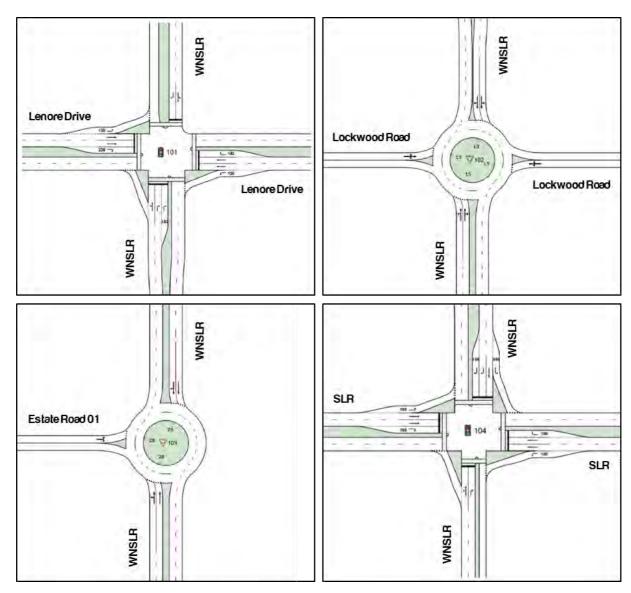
Approved Intersection Layouts – 2026 Modelling Scenario
